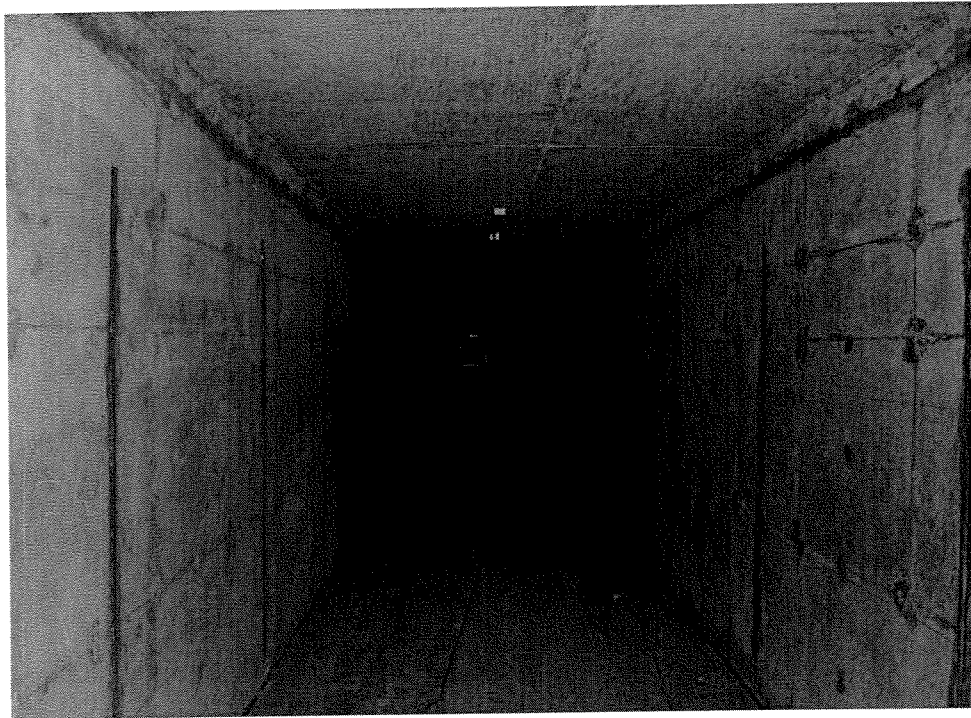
Test Stand No.1, Alpha Test Complex, 1956-1957. Instrumentation tunnel. Looking southwest. View of May 2005.
